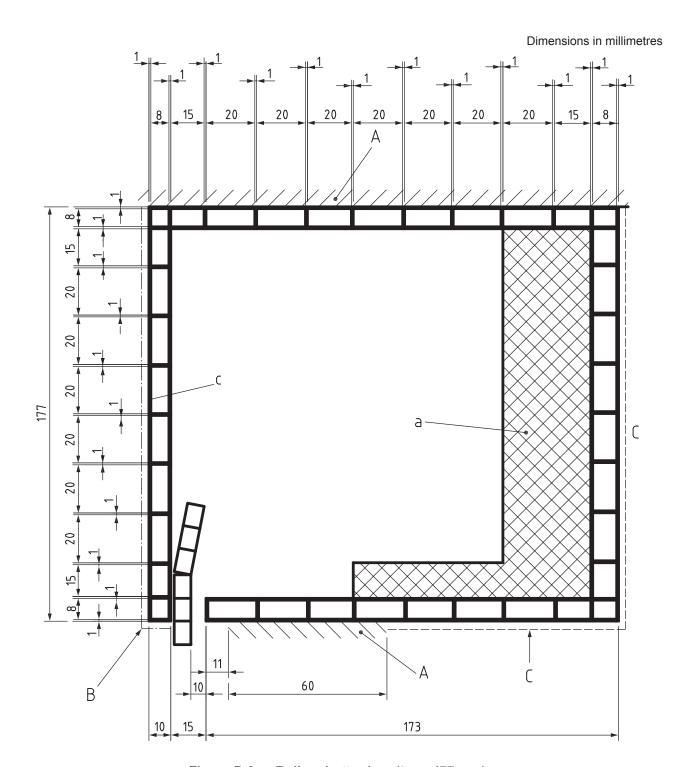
Roller shutter box ( $b_{\rm Sb}$  = 177 mm)
